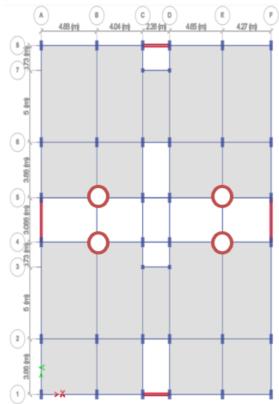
Plan view G+12 storey centre Shear walls shear wall wall
